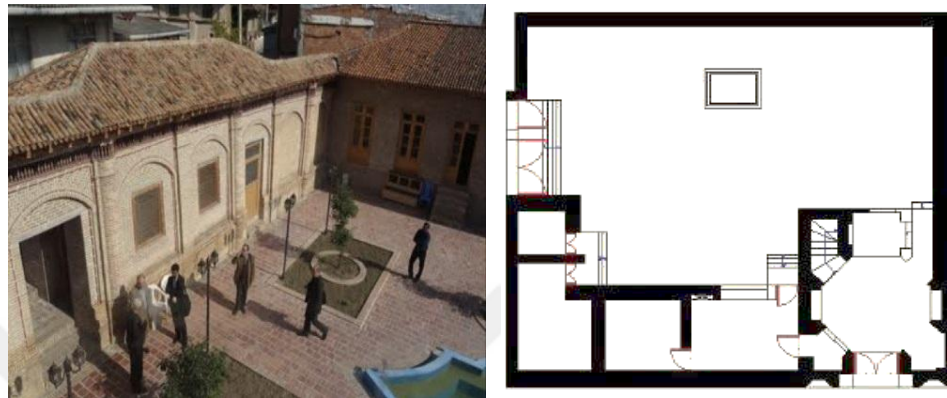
Picture and plan of Sari courtyard house example - Ramadani house
